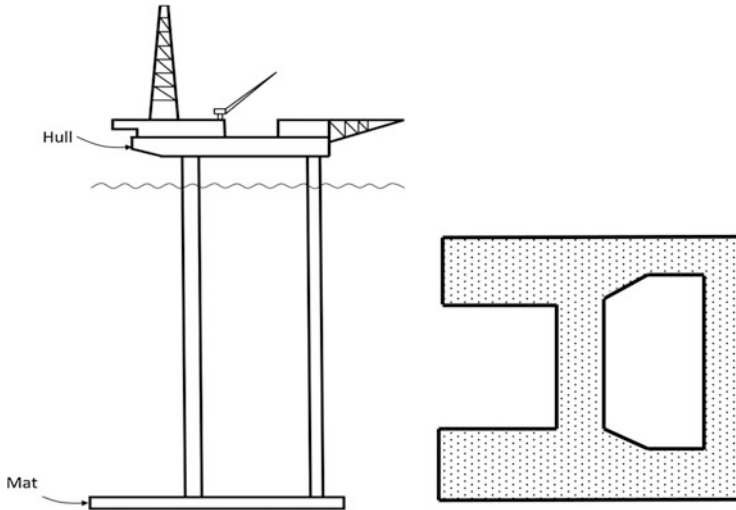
Plan view of mat foundation (Source: Young et al. [16])
